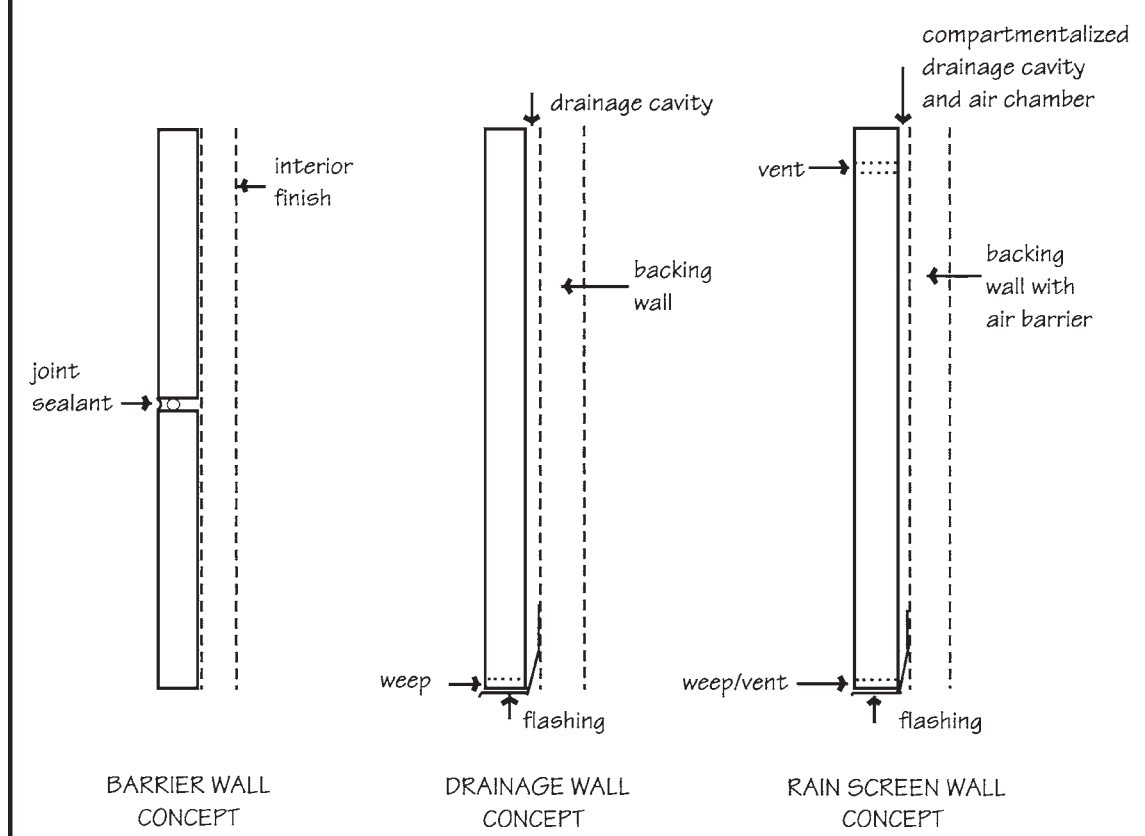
Exterior wall systems may incorporate a number of moisture protection strategies, but can generally be divided into three basic wall types: *barrier walls*, *drainage walls*, and *rain screen walls*. (From Beall and Jaffe, *Concrete and Masonry Databook*, McGraw-Hill, New York, 2003.)
